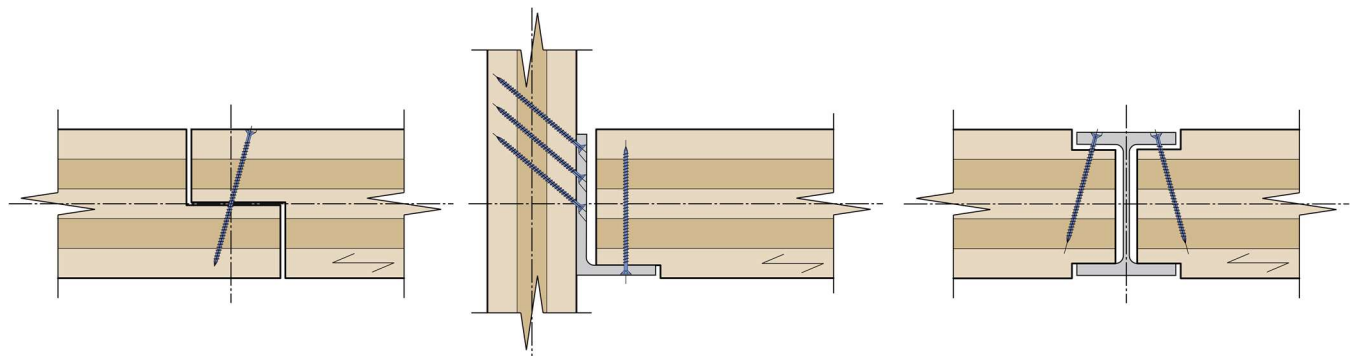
Various types of notches in CLT plates; a) Connection of two CLT plates. b) Connection of a CLT plate with a steel L-profile. c) Connection of CLT plates with a steel I-profile.
